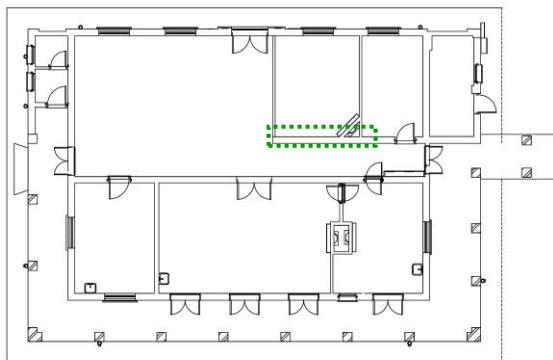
The concrete tank was supported directly on top of the brick partition highlighted in green. Edited by Hannah Liu.
